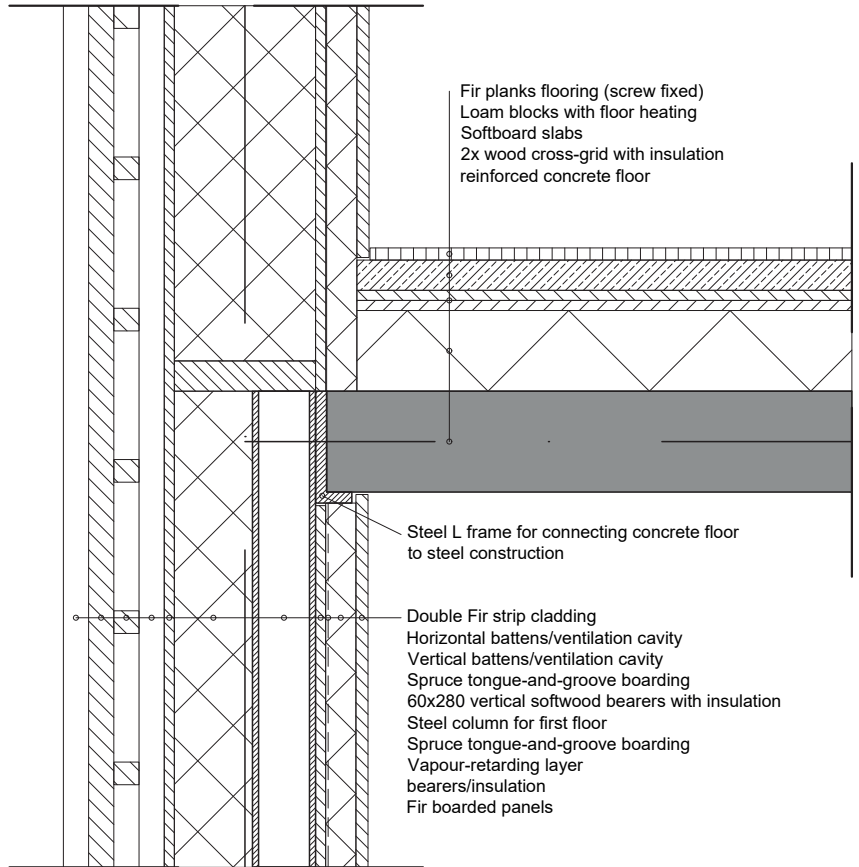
Vertical detail of connection between wooden shell and construction, 1:15
